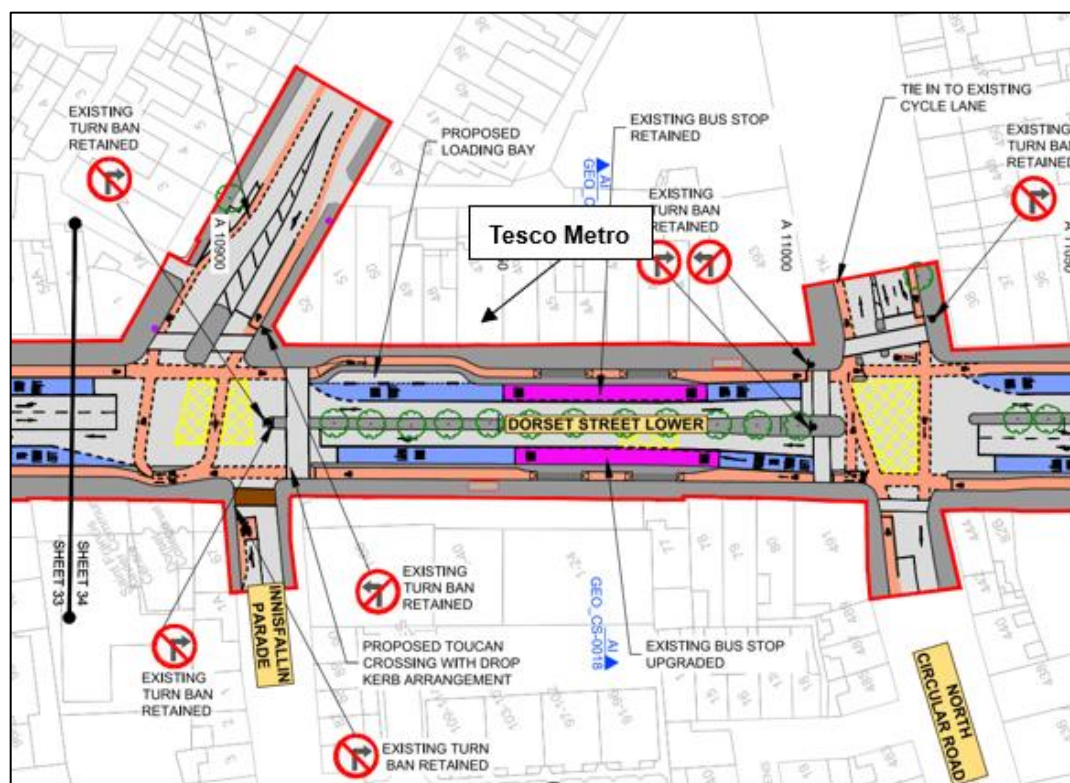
General Arrangement of Proposed Scheme at Tesco Metro, Dorset Street Lower (Sheet 34)
